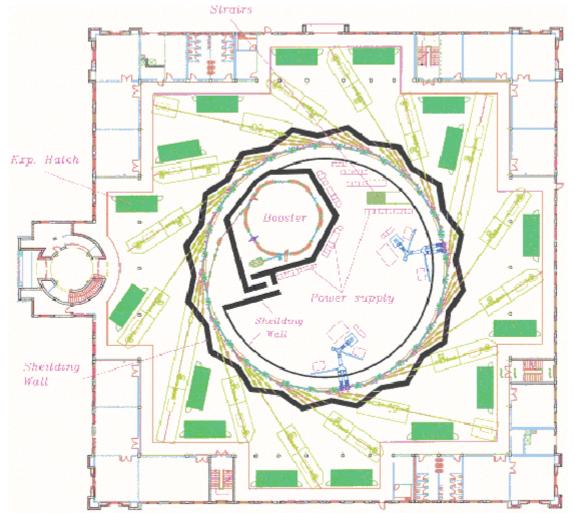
The ground floor of SESAME building with the storage ring, the shielding wall and the beam lines.
